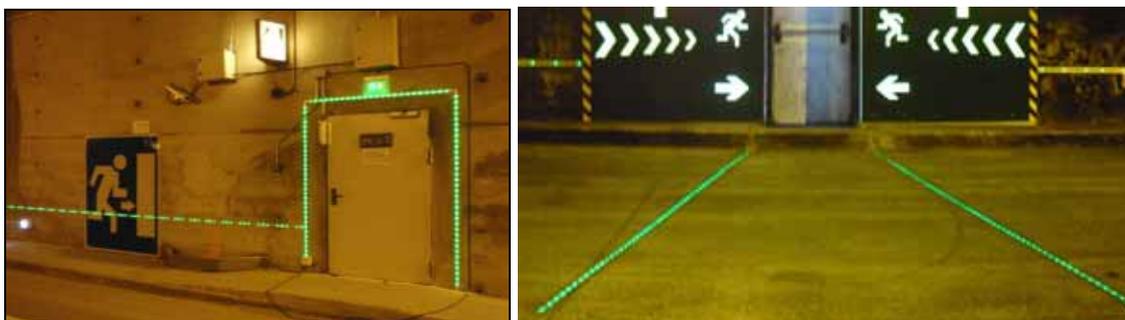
Different exit door awareness lighting applications. Dynamic green LED-stripes installed on the wall, in the road and in the exit door frame
